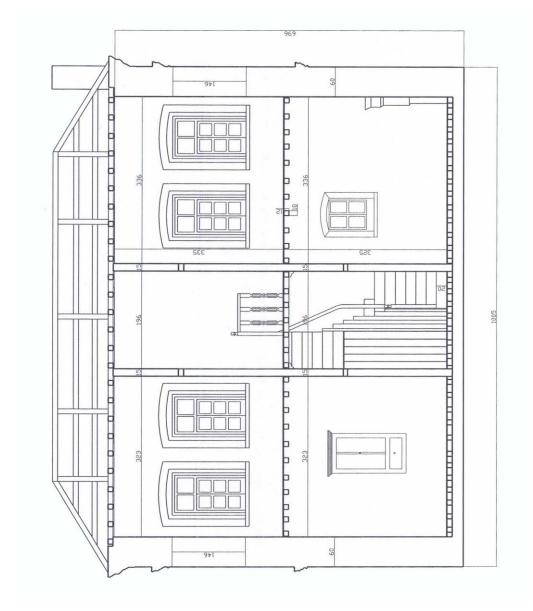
Section A-A view of 11-Hamam Street Scale: 1/75
